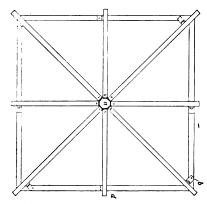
Plan of Louver Showing Structural Iron Framing.
